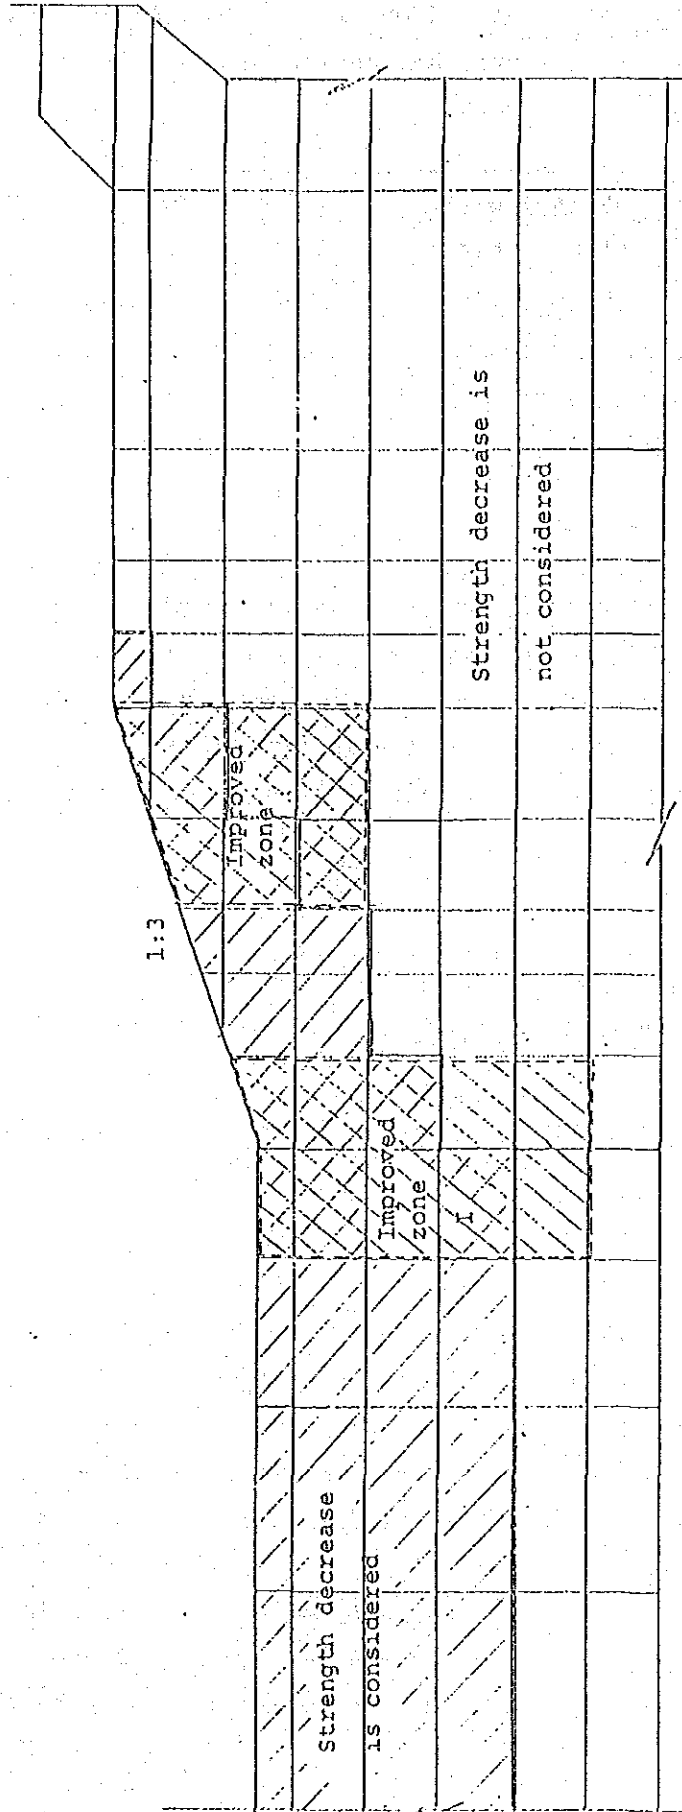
Mesh Model for Improvement Slope by Soil Cement Columns
